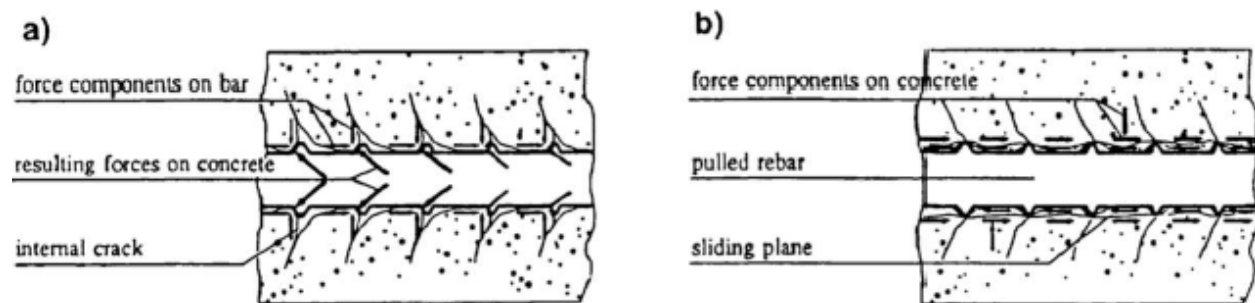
Deformations around the reinforcing bar (Den Uijl and Bigaj (1999) cited by FIB, 2009)
